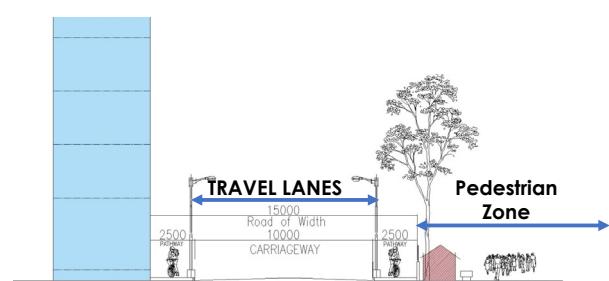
Proposed Cross-section of 15M wide Orient Row Road
